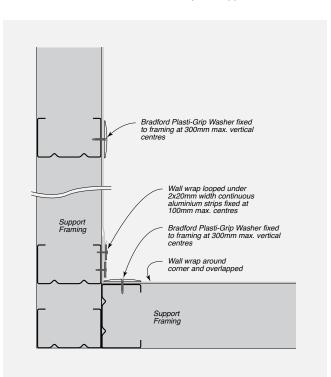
Internal Corner - Wall Wrap Overlapped
